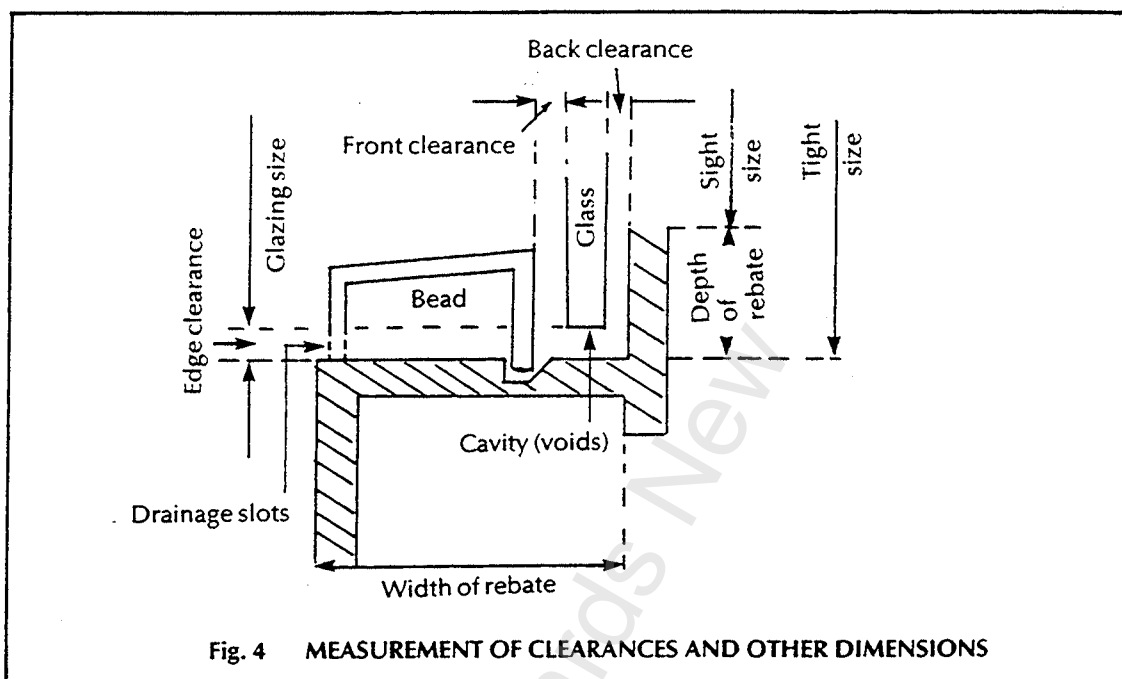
MEASUREMENT OF CLEARANCES AND OTHER DIMENSIONS
